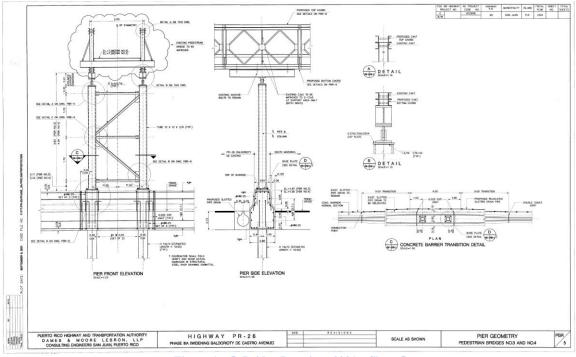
Bridge Drawings 2001 – Sheet 5
